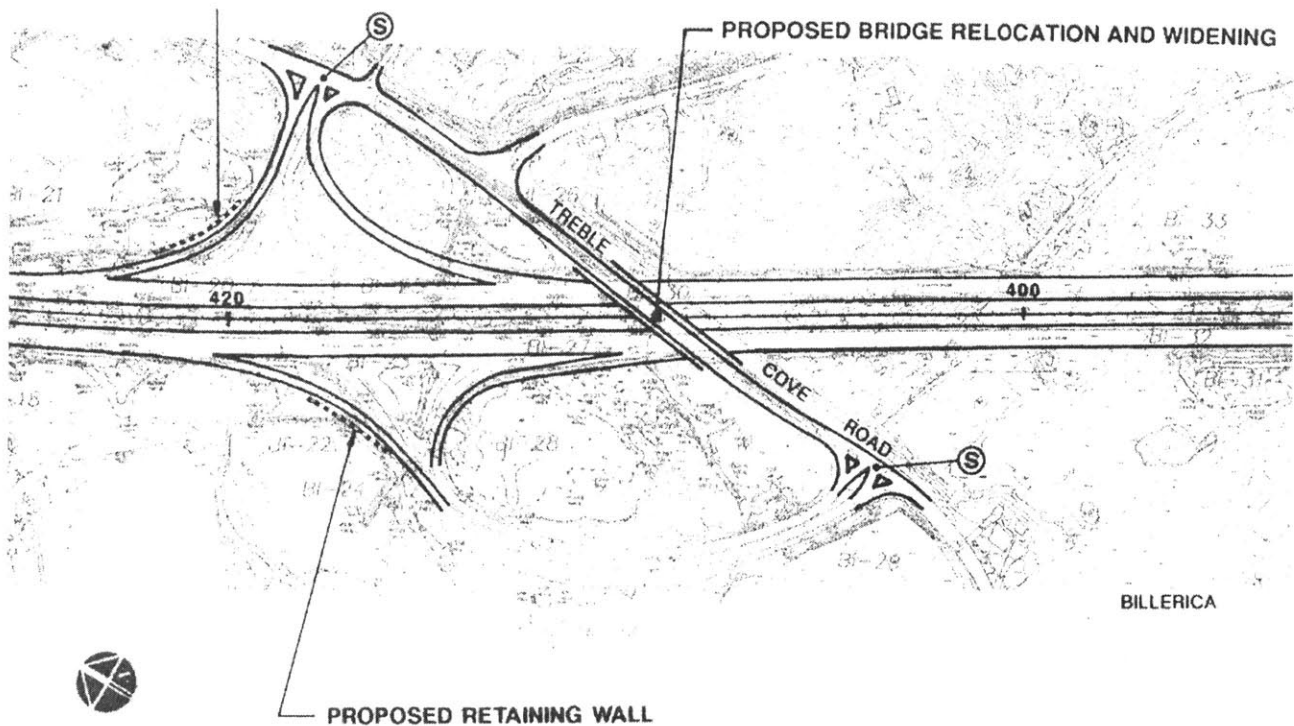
Plan View of Treble Cove Road Bridge Relocation (NTS)
